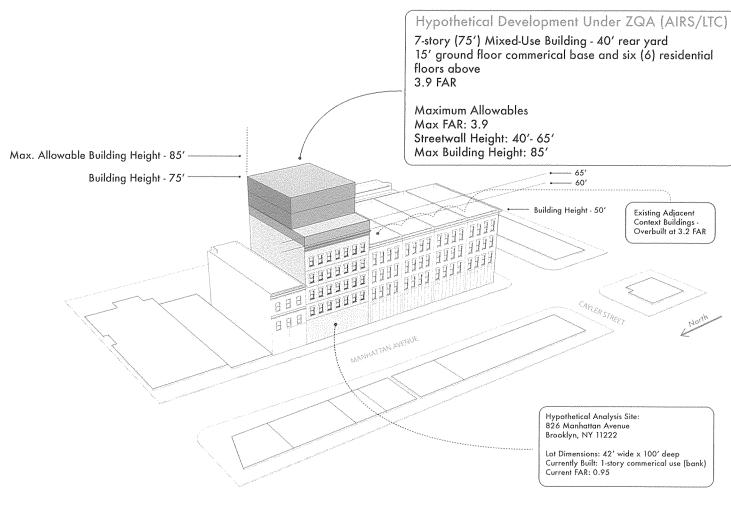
826 MANHATTAN AVENUE SITE ANALYSIS-ZQA (AIRS/LTC)
